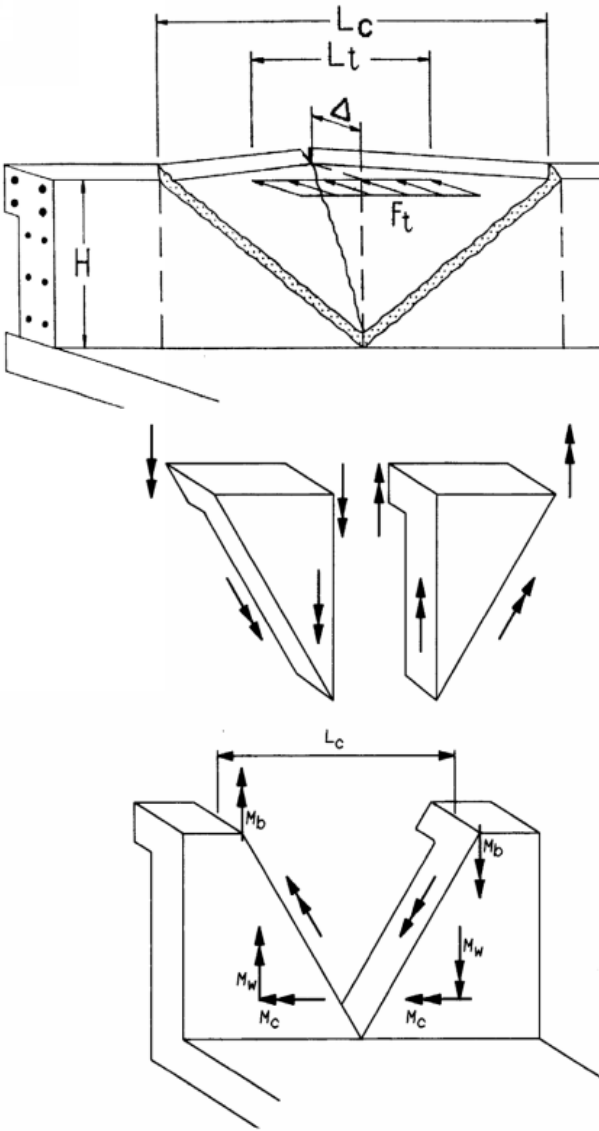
Illustration of design parameters using yield line analysis of concrete parapet walls for impact within wall segment (AASHTO LRFD Figure CA13.3.1-1)
